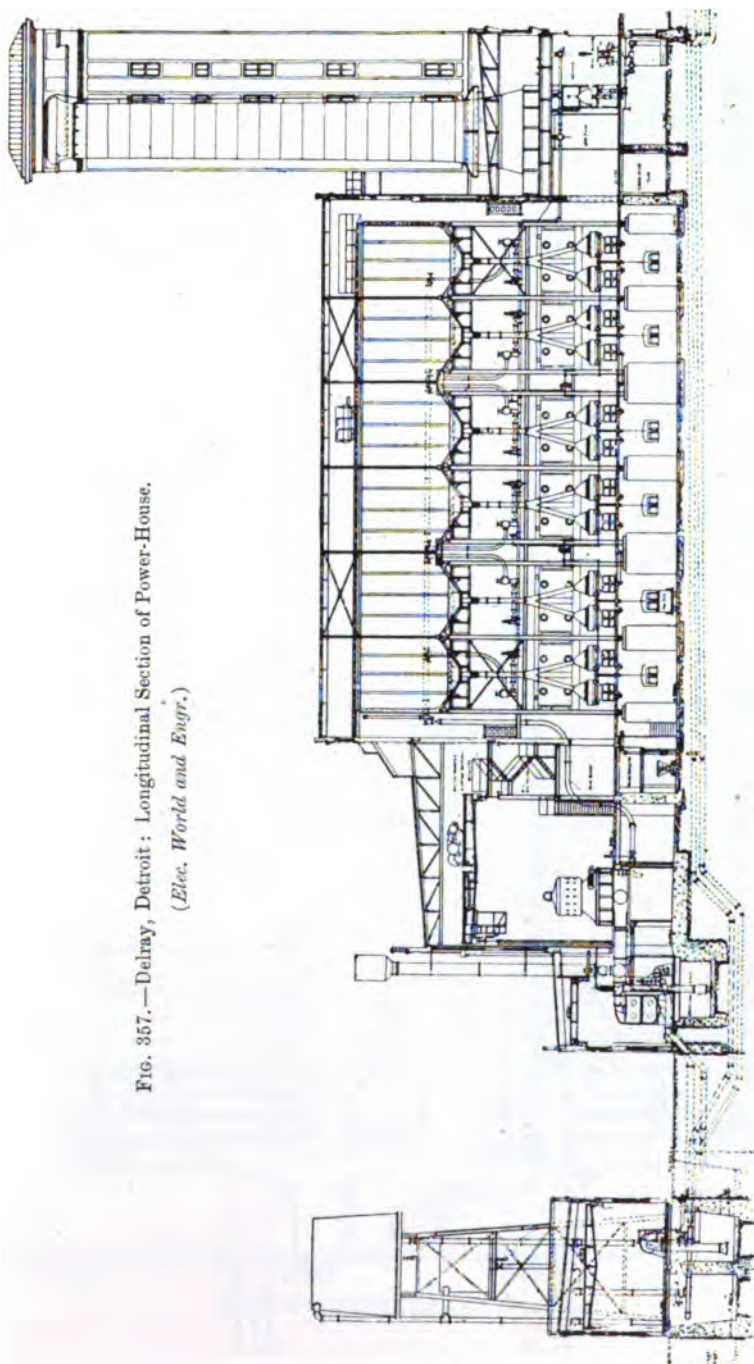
Delray, Detroit : Longitudinal Section of Power-House.
